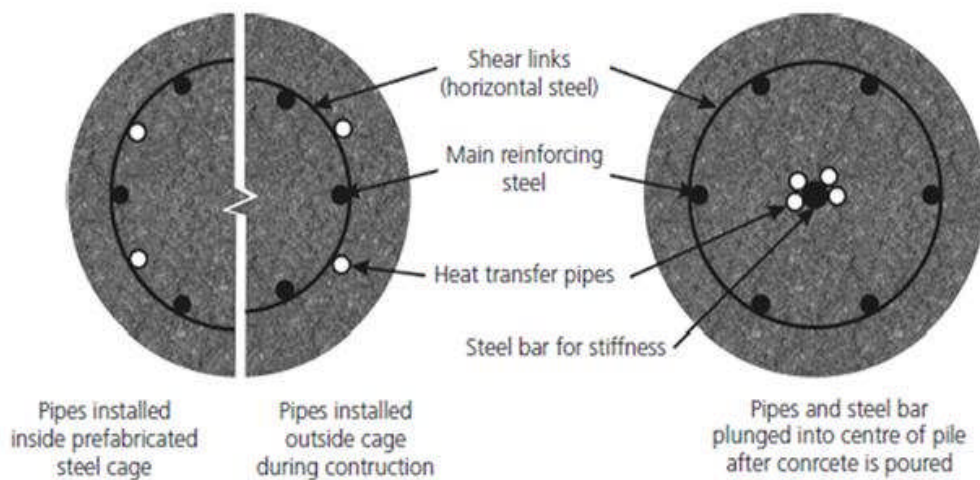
Typical thermal pile construction details (Loveridge and Powrie, 2012)
